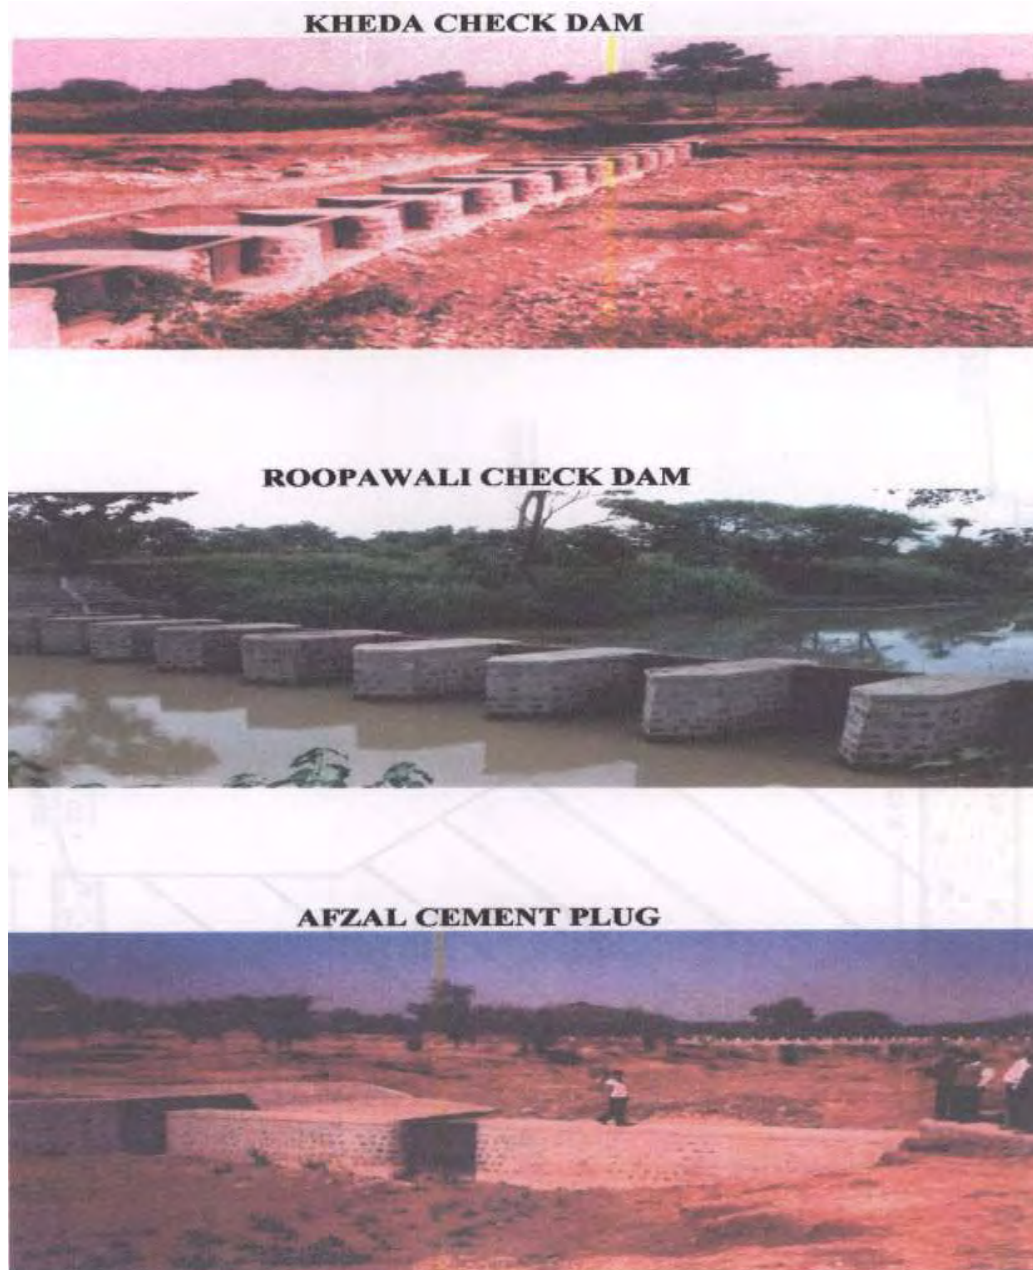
AR Structures constructed at Kheda, Roopawali, Afzal villages
